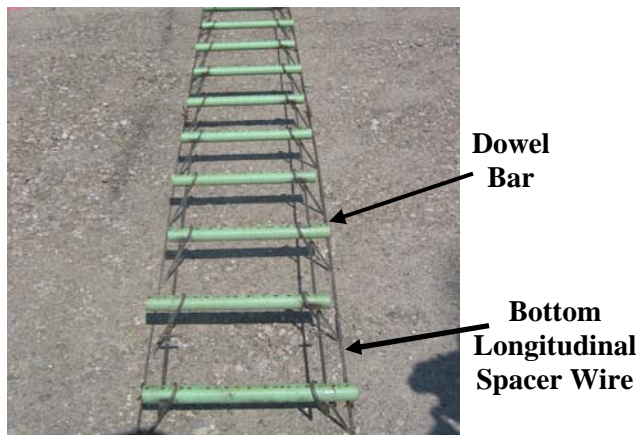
Typical dowel basket assembly used as load transfer devices in JPCP
